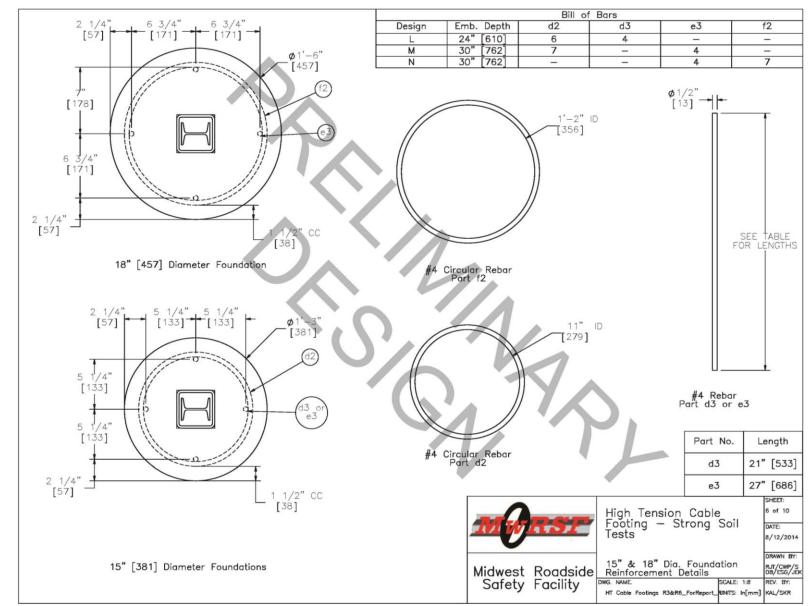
Reinforcement Details for Increased Diameter Foundations, Test Nos. HTCB-17 and HTCB-18
